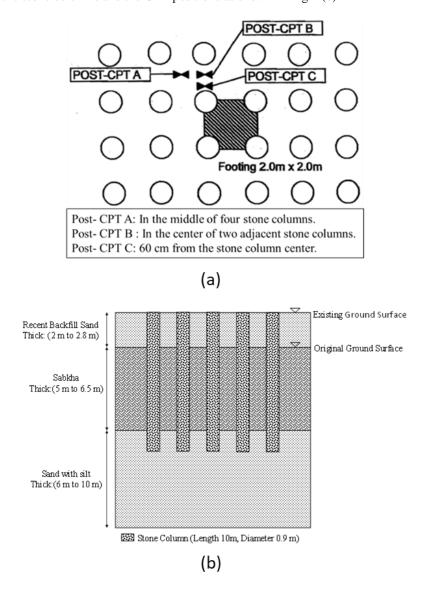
(a) Typical Existing Soil Profile within Projects Site.(b) Layout for full - Scale Field footing Load Tests and Post-CPT's.
